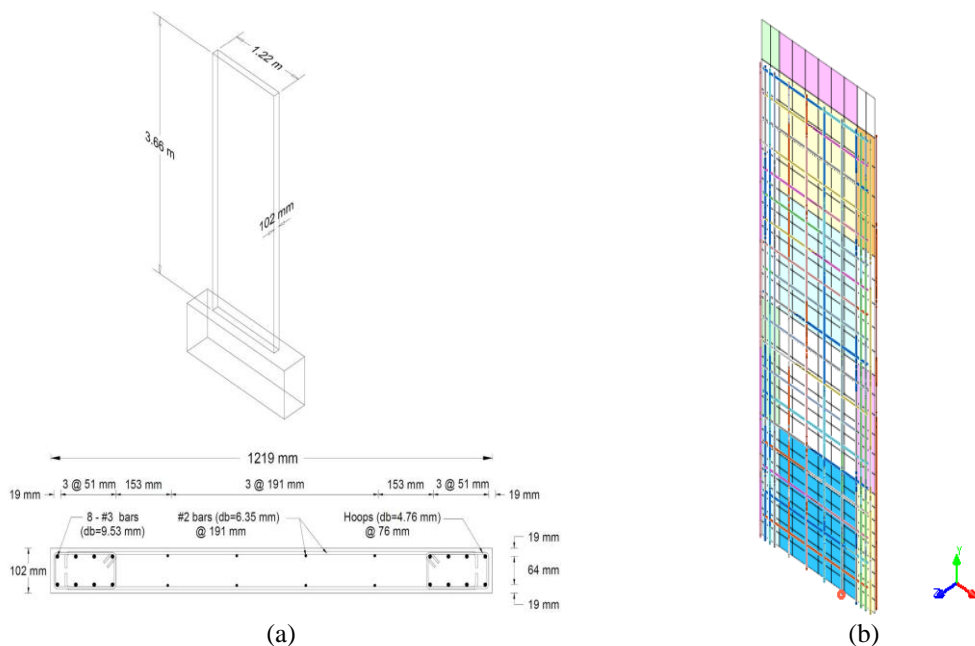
Specimen RW2: (a) geometry and reinforcement details (Thomsen IV and Wallace 2004, Orakcal *et al.* 2006); (b) finite element model
